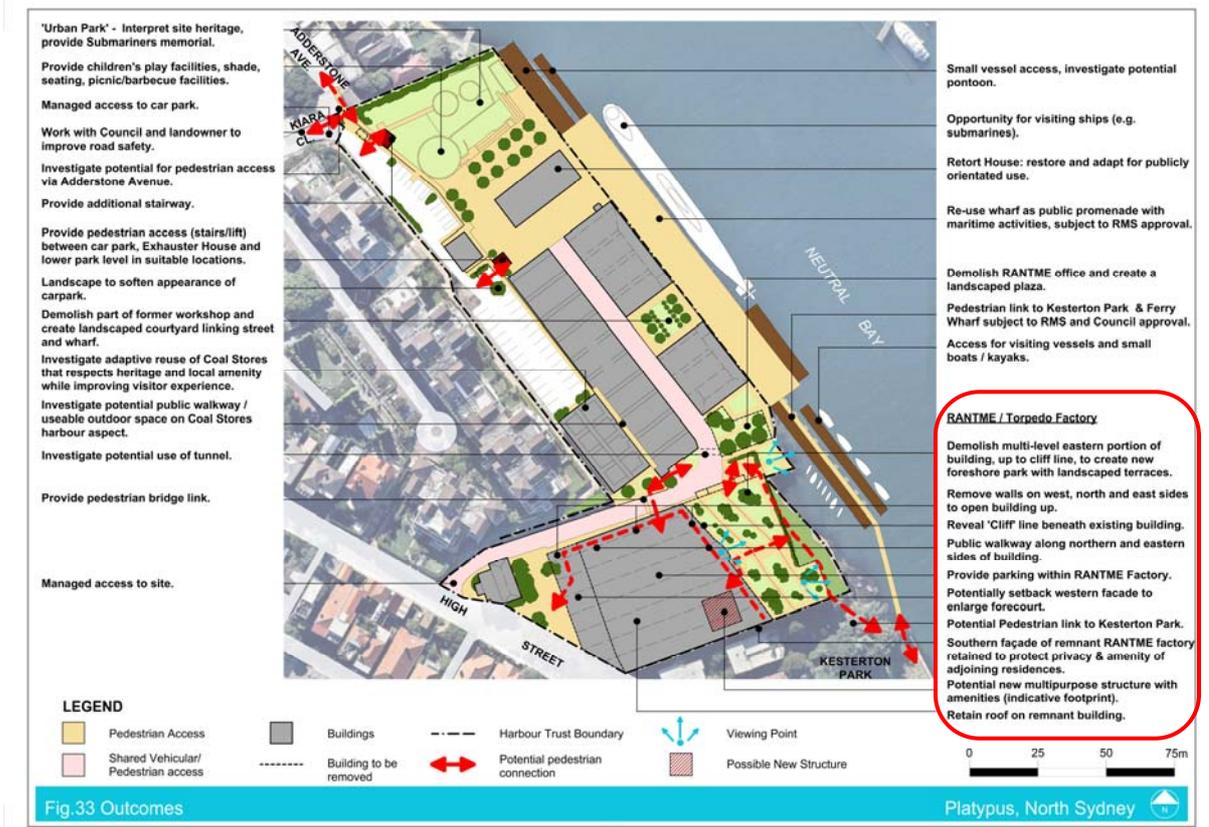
Figure 33 Outcomes from the *Draft Management Plan (2020)* showing detailed outcomes for the site. Outcomes relevant to this proposal are outlined in red. Source: *Draft Management Plan Sub Base Platypus, North Sydney (2020)*, p. 53
